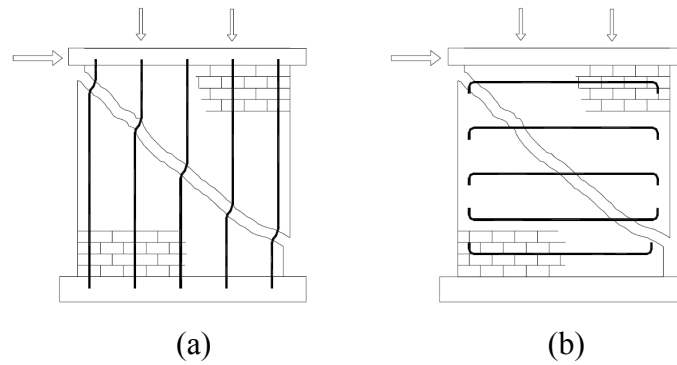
Reinforcement mechanism for reinforced masonry wall: (a) Vertical reinforcement, (b) Horizontal reinforcement.
